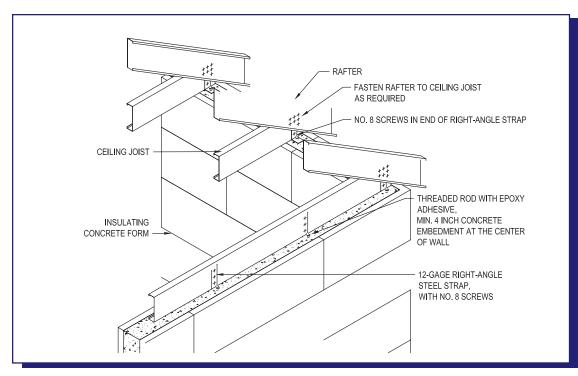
Steel Strap With Epoxy Anchor Connection Method at End Roof Joist to Wall Perpendicular to Ridge
